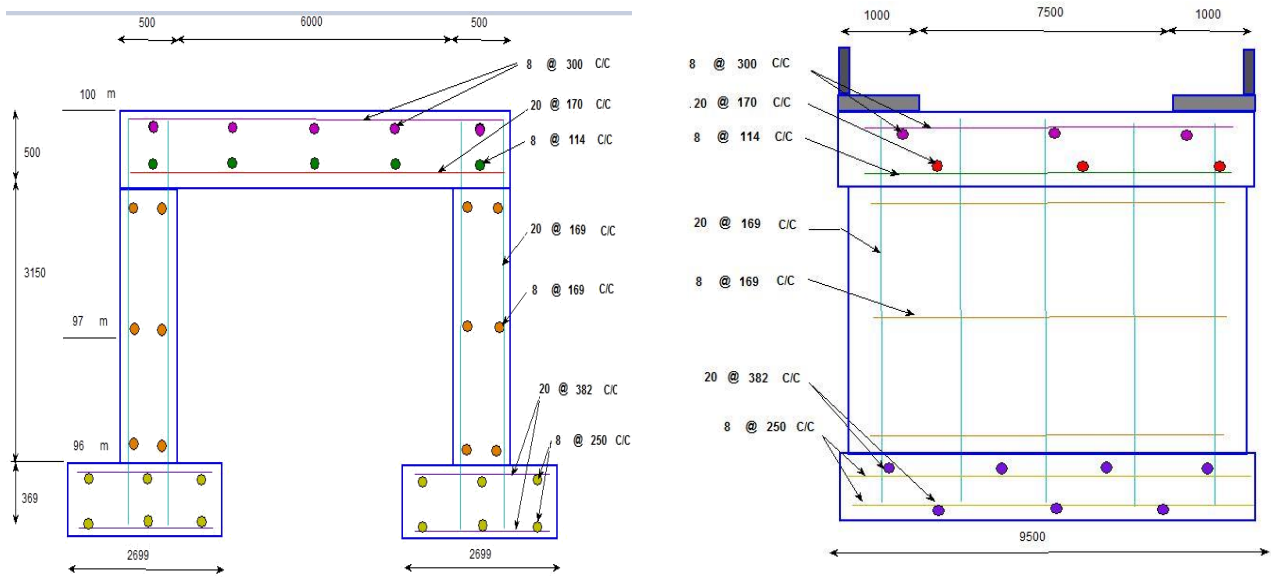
Design details in longitudinal and cross section of Solid Deck Slab Bridge [All dimensions are in mm]
